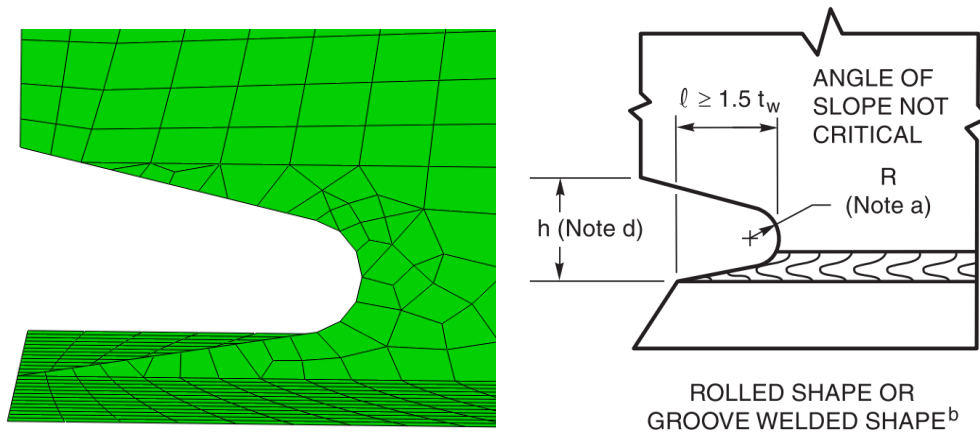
Modelling of the web access holes (left) and design guidelines for the weld access holes (right) [6]
